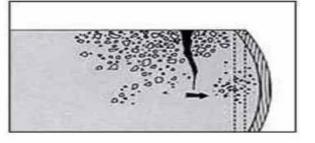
Defects in Concrete due to Formwork Movement
